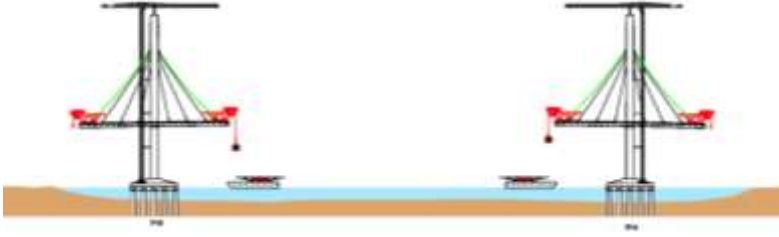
Construction of the cable-stayed bridge by balanced cantilevers.
